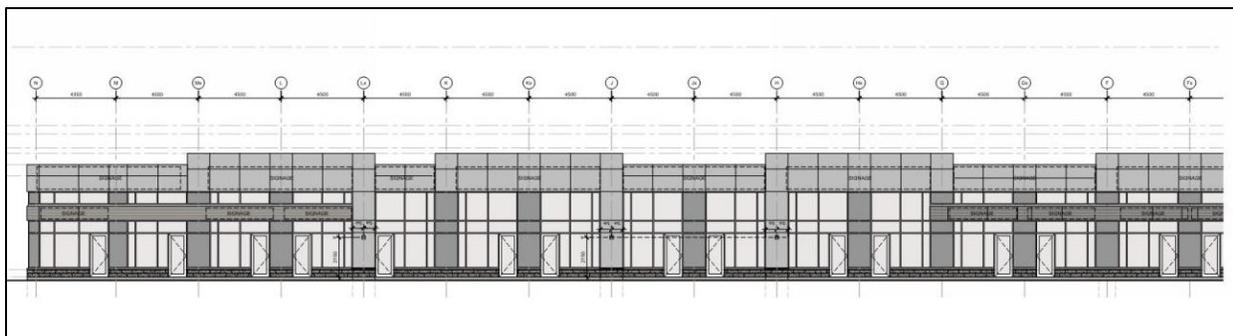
Conceptual multi-unit retail building partial elevation – View looking south (shown as North Elevation on 1 – A300 dated January 16, 2019).
